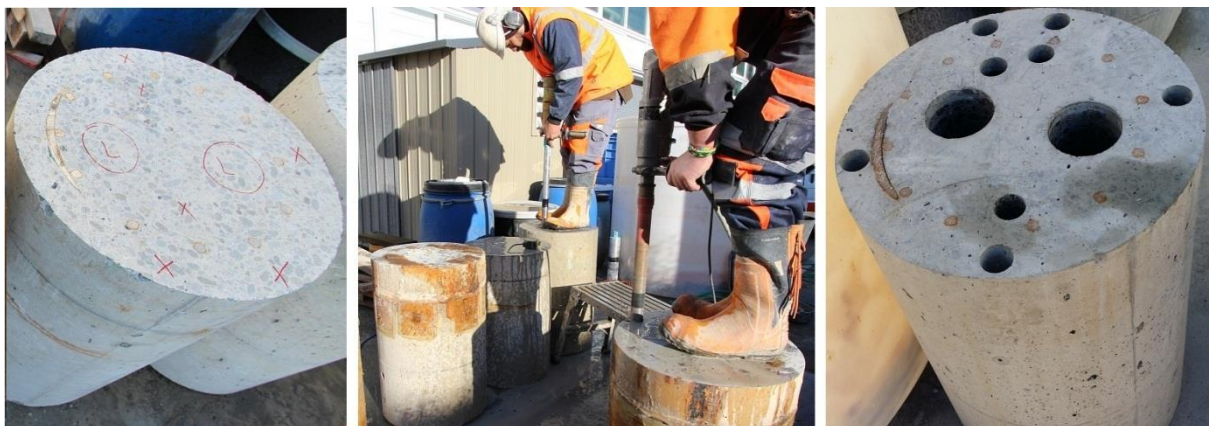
Details of taking cores from column cover (OUT) and core column (IN)
